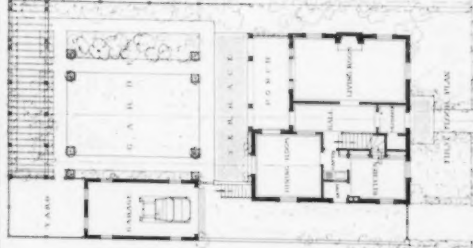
and 248 are both similar in plan, toward the street, to the first prize drawing, but the three rooms located across the front require more space in both cases than would be allowable on so narrow a lot. In No. 134 there exists some further doubt as to the treatment of the roof at the rear. In all probability it would require a considerable deck, but a flat hip roof running into the main roof might be employed to advantage. The plans present fairly compact developments of two well defined types, but in the carrying out both would be much bettered by a wider frontage, as has been acknowledged by the
